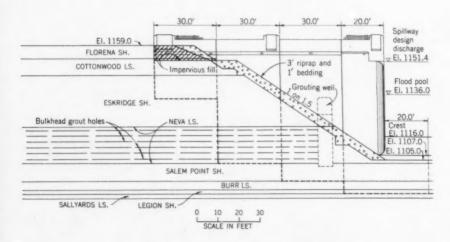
,-UPSTREAM ELEVATION-SPILLWAY BULKHEAD
